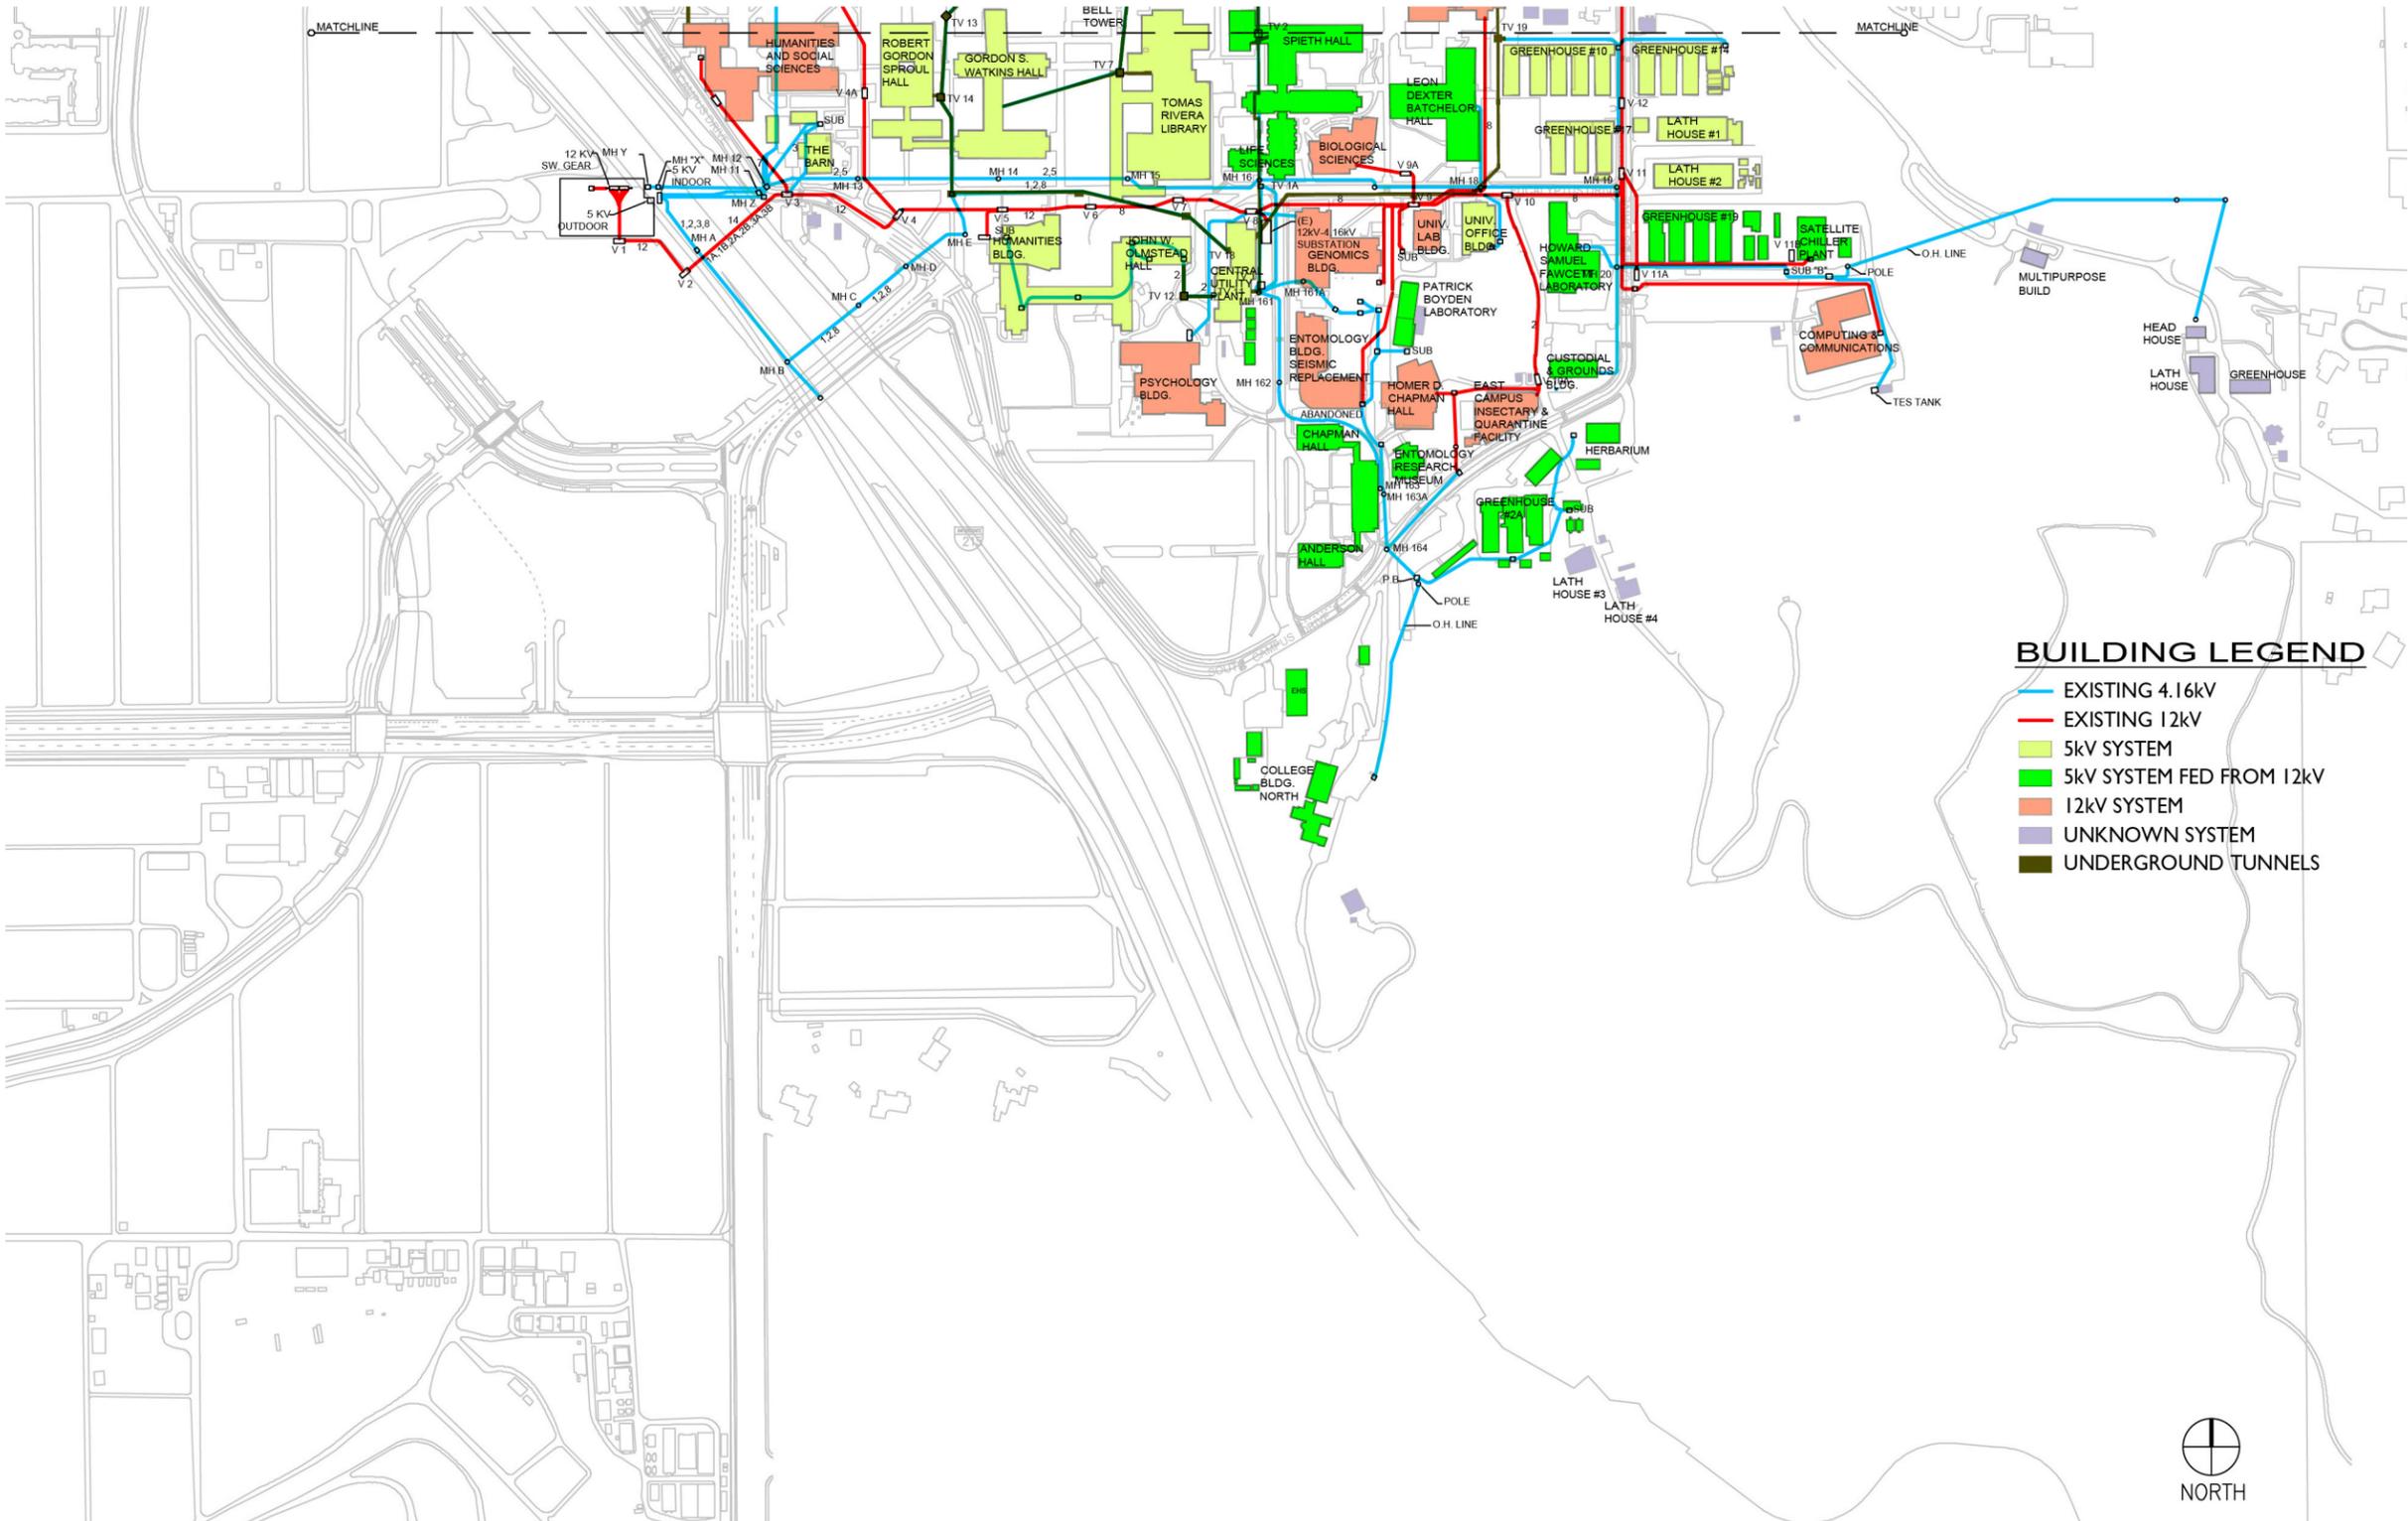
Existing 4.16kV and 12kV Electrical Site Plan by System—South
